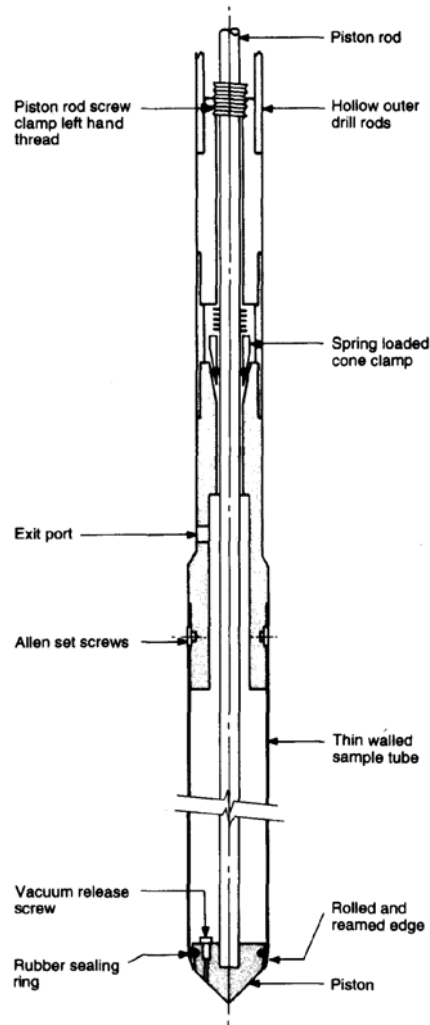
Thin-walled seamless steel tube fixed piston sampler.
